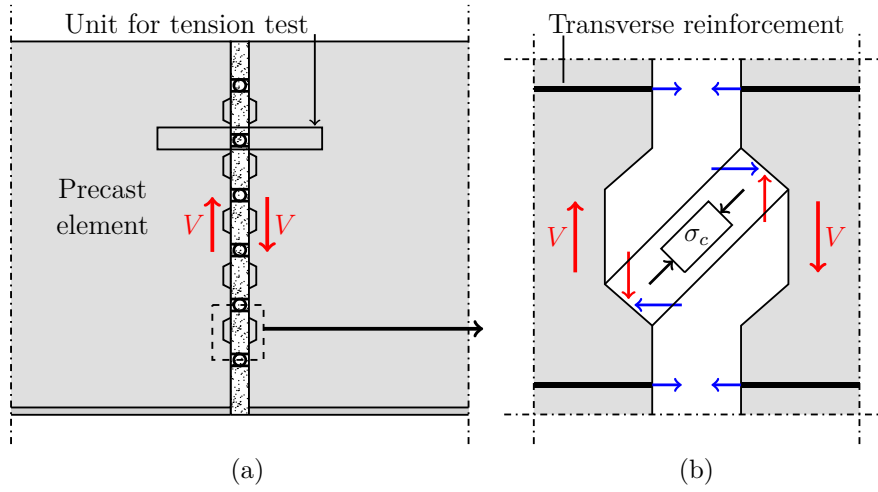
(a) Loading of shear wall connection and (b) activation of reinforcement, when strut action is developed between the shear keys
